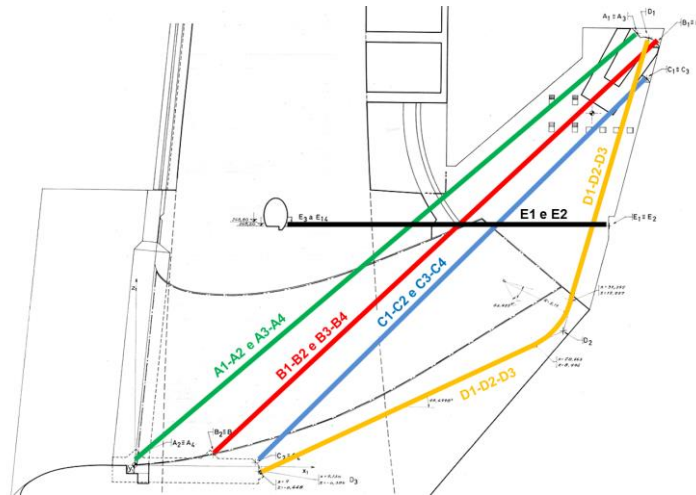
Prestressing tendons connecting the spillway structures to the dam's body (adapted from the design drawing n° 18408-B)
